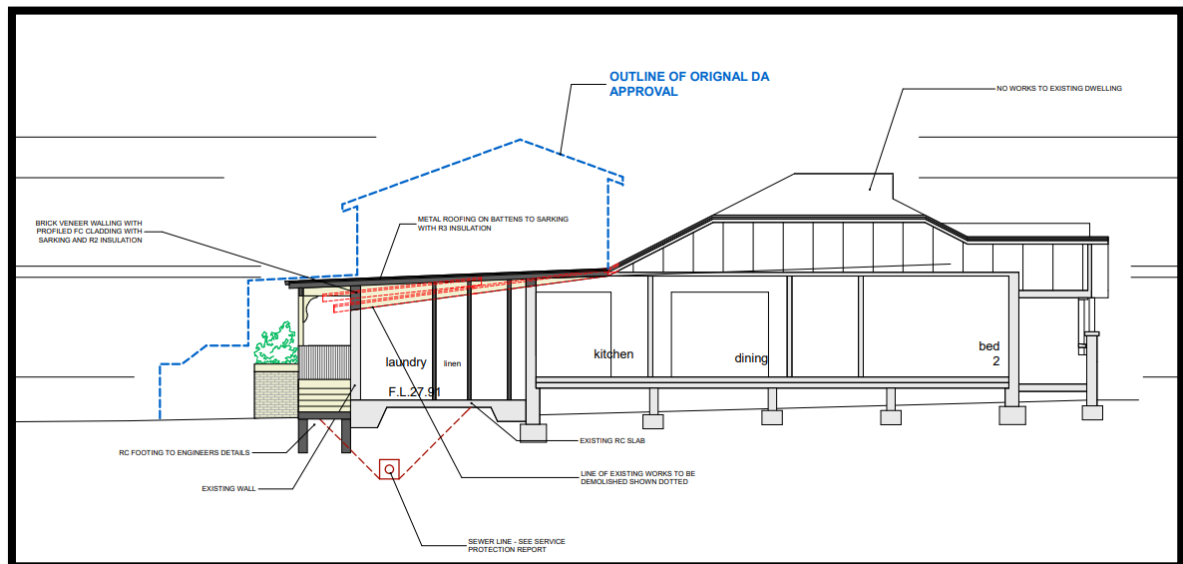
(DA 2018.124.3) - Proposed Modification to the South Elevation
